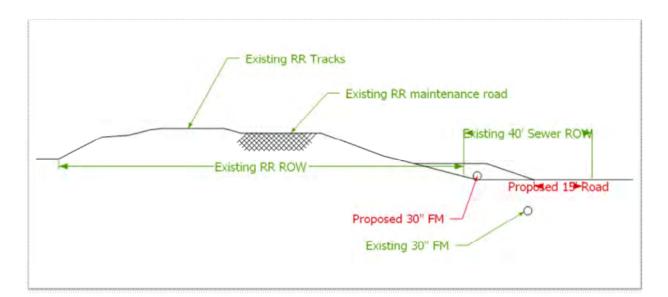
TYPICAL SECTION OF SCPS FM
